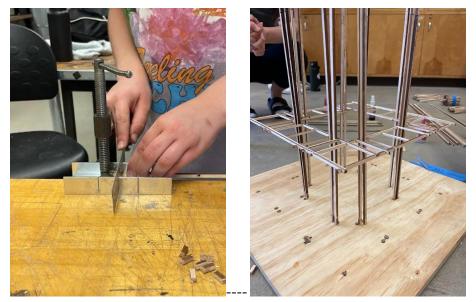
(a) Column Extender Pieces (b) Checking Column Location/Angle Pre-Epoxy
